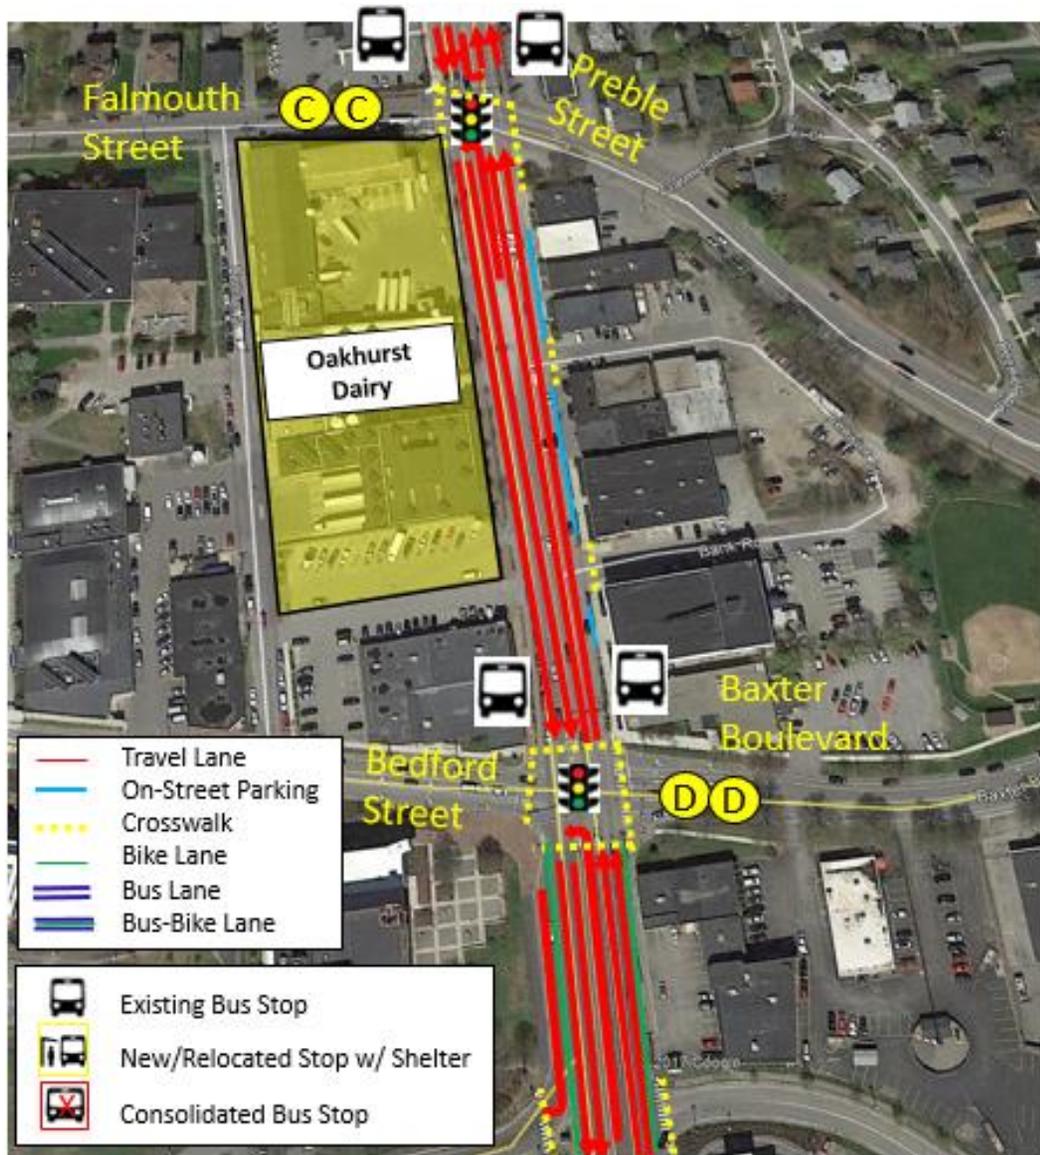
Falmouth Street/Preble Street to Bedford Street/Baxter Boulevard — Existing/No-Build Condition
